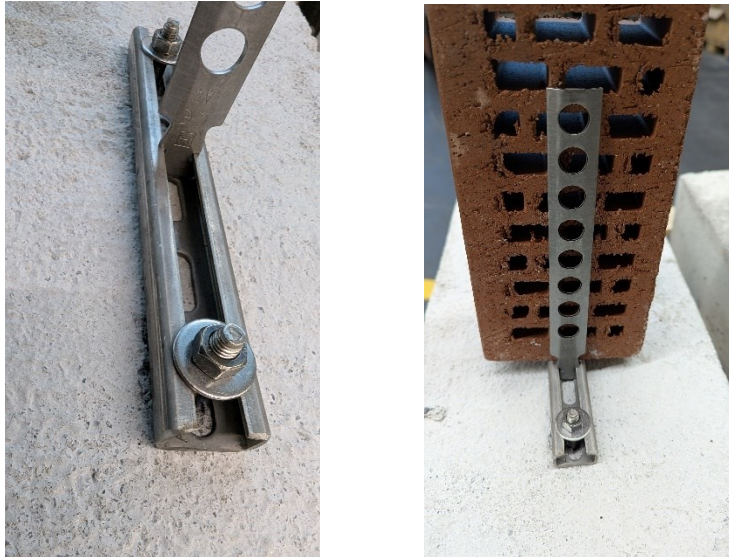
a) post installed anchor channel; b) flat anchor interlocking with the channel.
